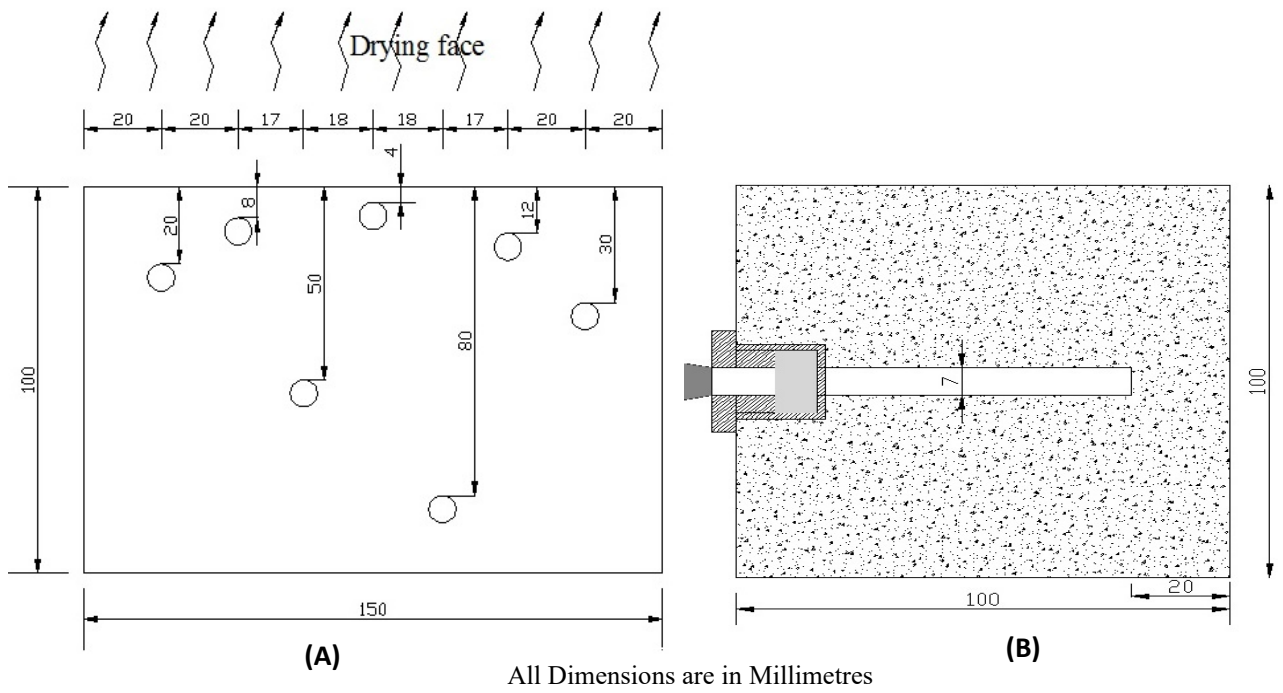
Arrangement of cavities in concrete prism (A) Elevation, (B) Cross-section through cavity
